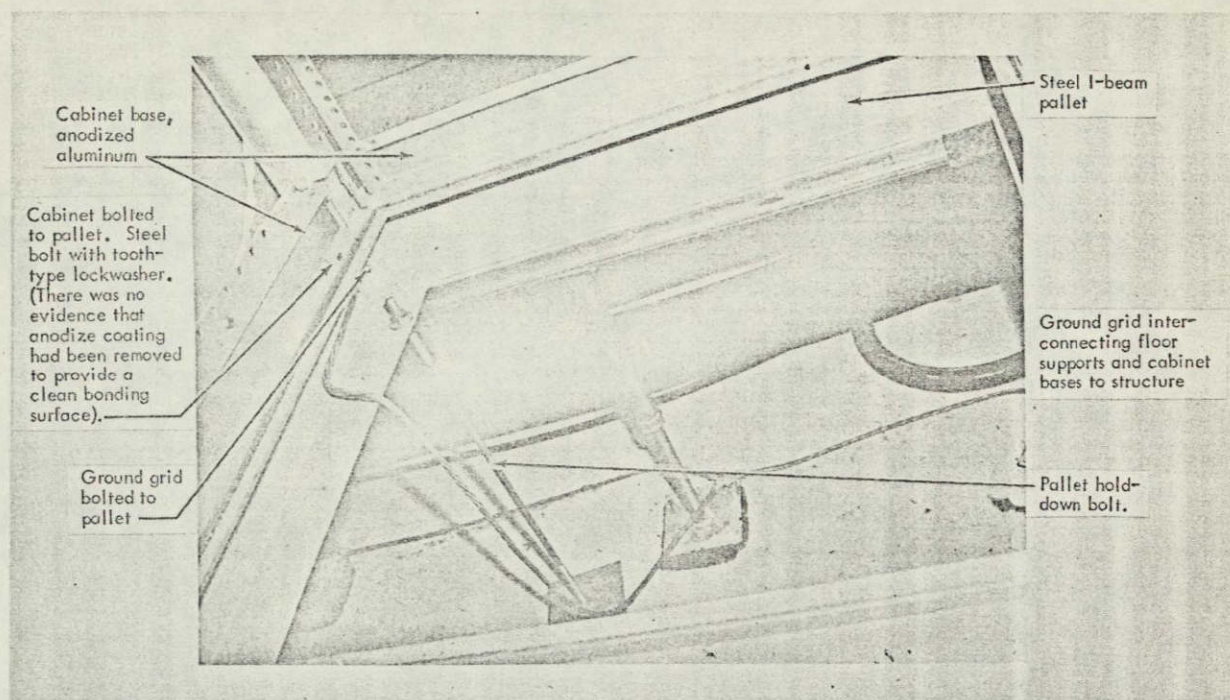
LCC Firing Room 3 - Utilization of Facility Ground.
